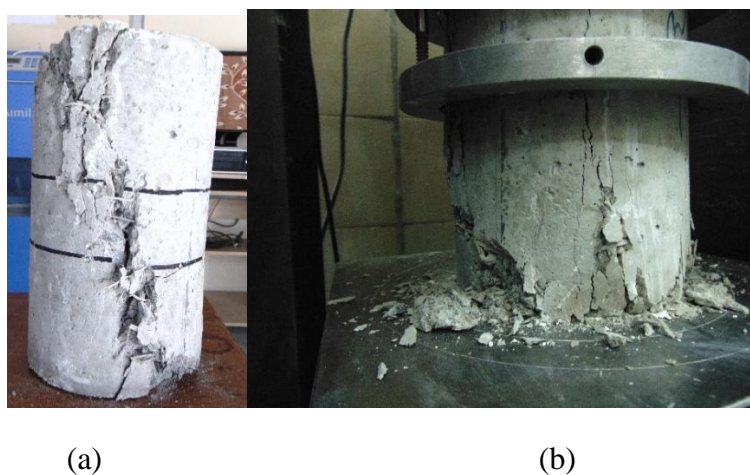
Failure in fiber reinforced concrete specimens; (a) cylinder; (b) cube
